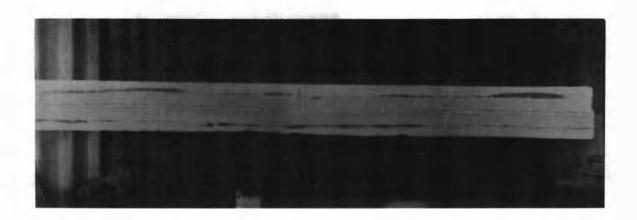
Built-up beam 4 by 8 in. with 80-in. span made by welding together 4 smaller beams. 4 per cent pulp. Note ice seams at mid section of small beams which were built up by two 2-in. layers. Parallel dark lines, both vertically and horizontally are due to pure ice at junction of weld pulp and surfaces of beams. After welding surfaces are planed to smooth, glassy finish. See Table 6.
